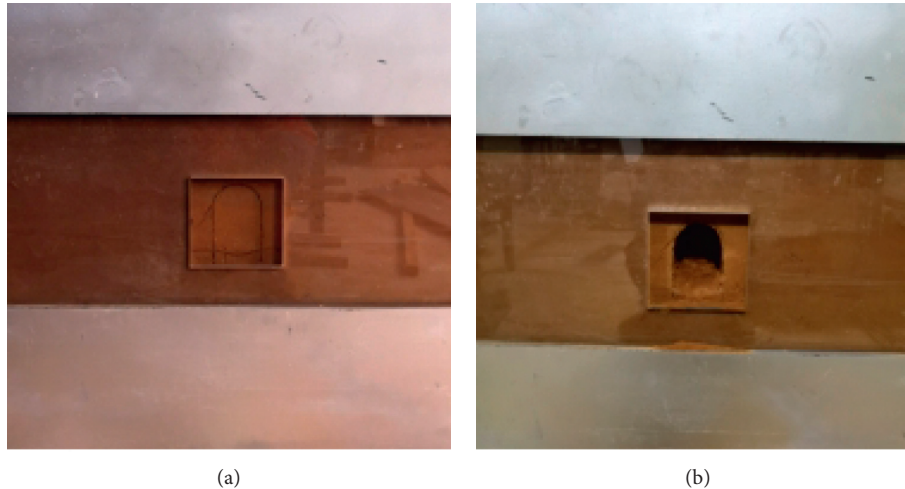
Basic process of model excavation. (a) Excavation contour line. (b) Tunnel excavation.
